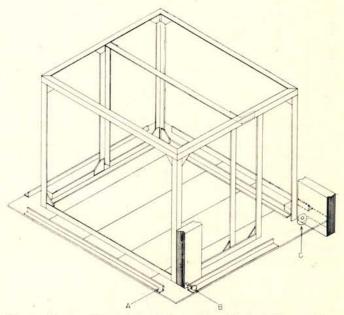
Construction details of steel room. (a) Angle iron used to clamp walls to frame with (b) Log bolts. (c) lower roller bearings which support steel door.
